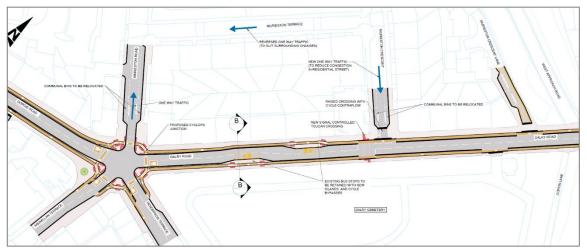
Gorgie Dalry junction to West Approach Road bridge
